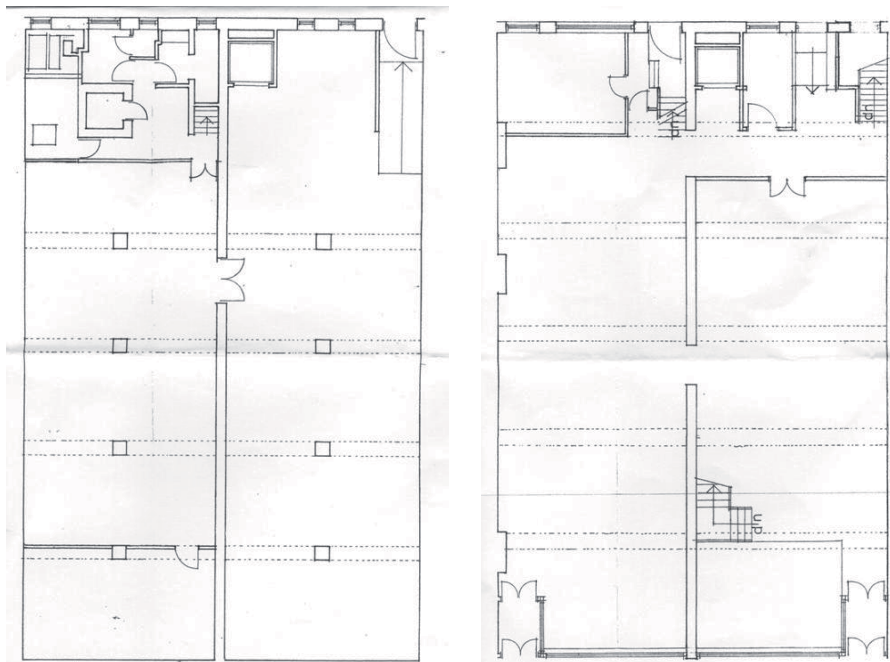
(left) Existing basement plan of Cooke's Buildings in 1986
